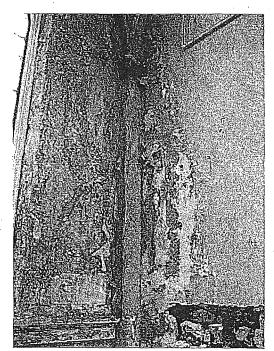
Structural cracking and separation of plaster details from masonry substrate caused by moisture from blocked drains.
